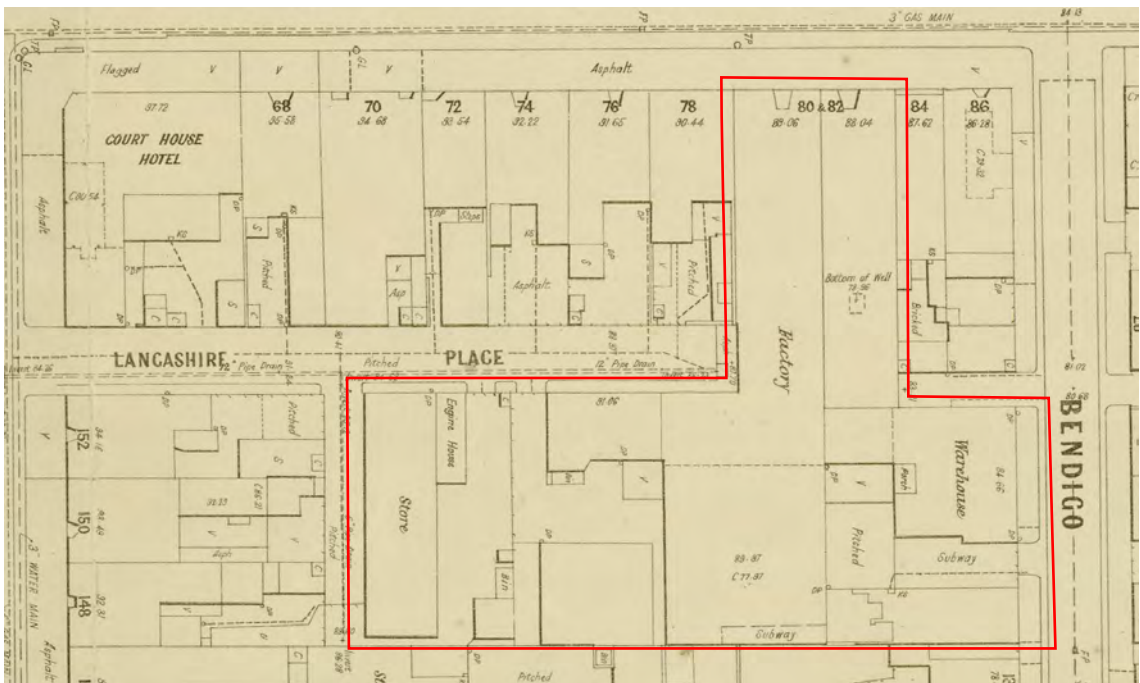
MMBW detail plan no. 759 showing King & King's premises fronting Errol and Bendigo streets, 1896, including factory, warehouse, store, and engine house (indicated)
